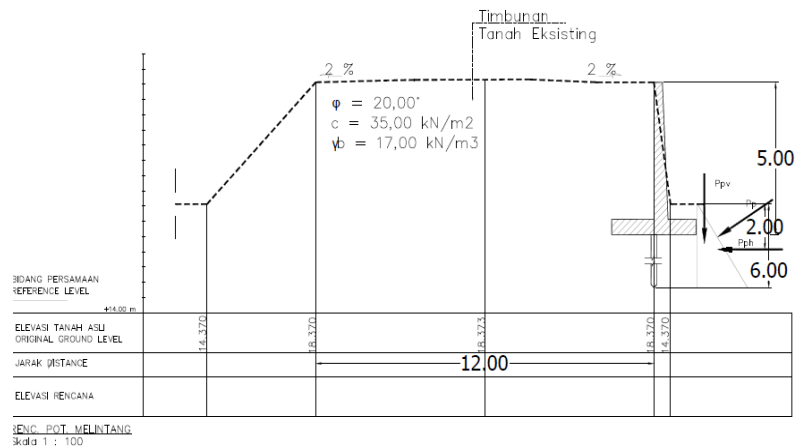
Passive earth pressure diagram on cantilever retaining wall
